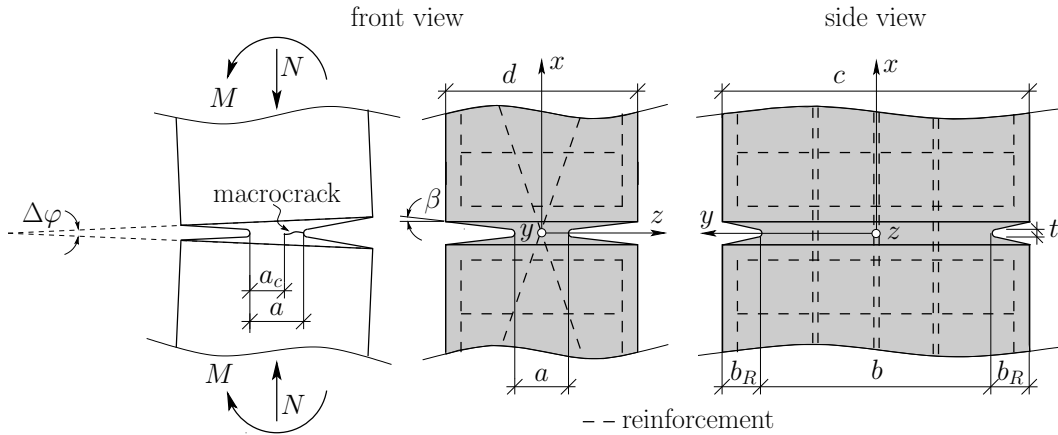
Geometric dimensioning of a concrete hinge with reinforcement crossing at the centerline of the neck;  $a_c$  denotes the width of the compressed ligament
